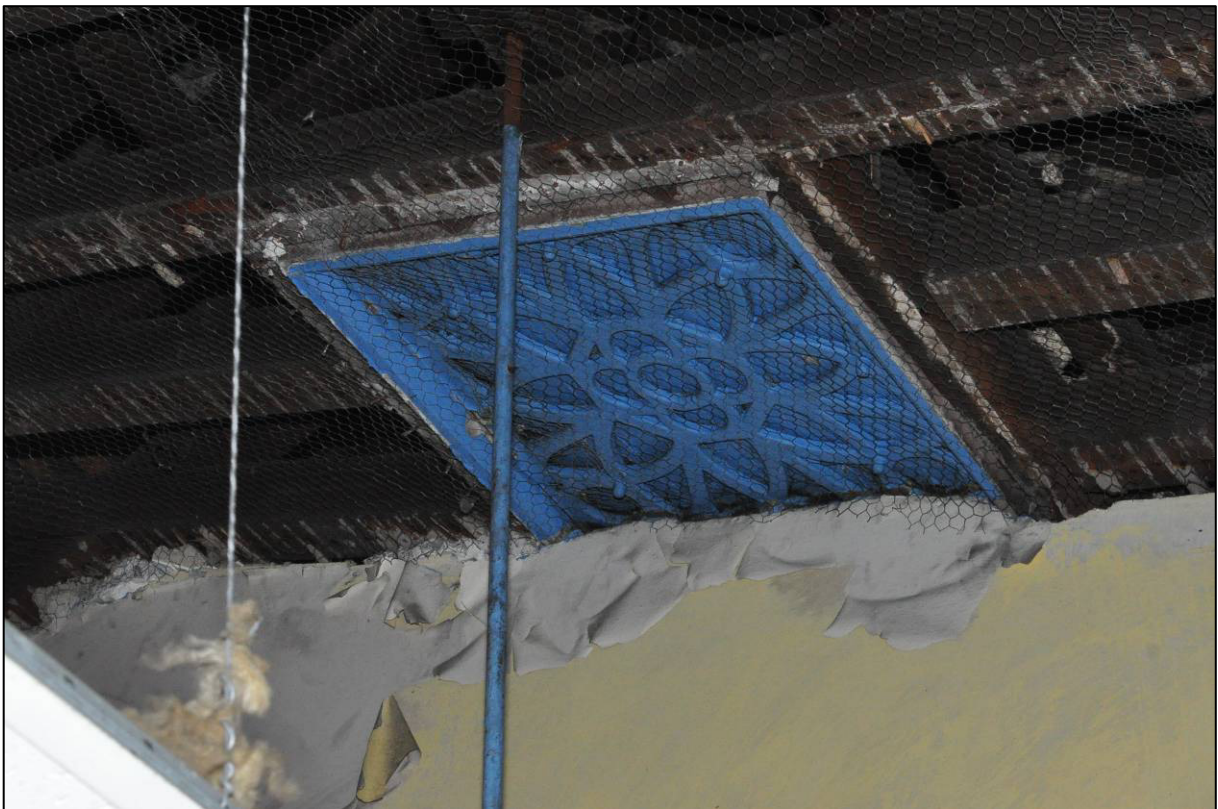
1879 Board School, science classroom (1F6), original roof vent over suspended ceiling, looking E (photo 2479).
